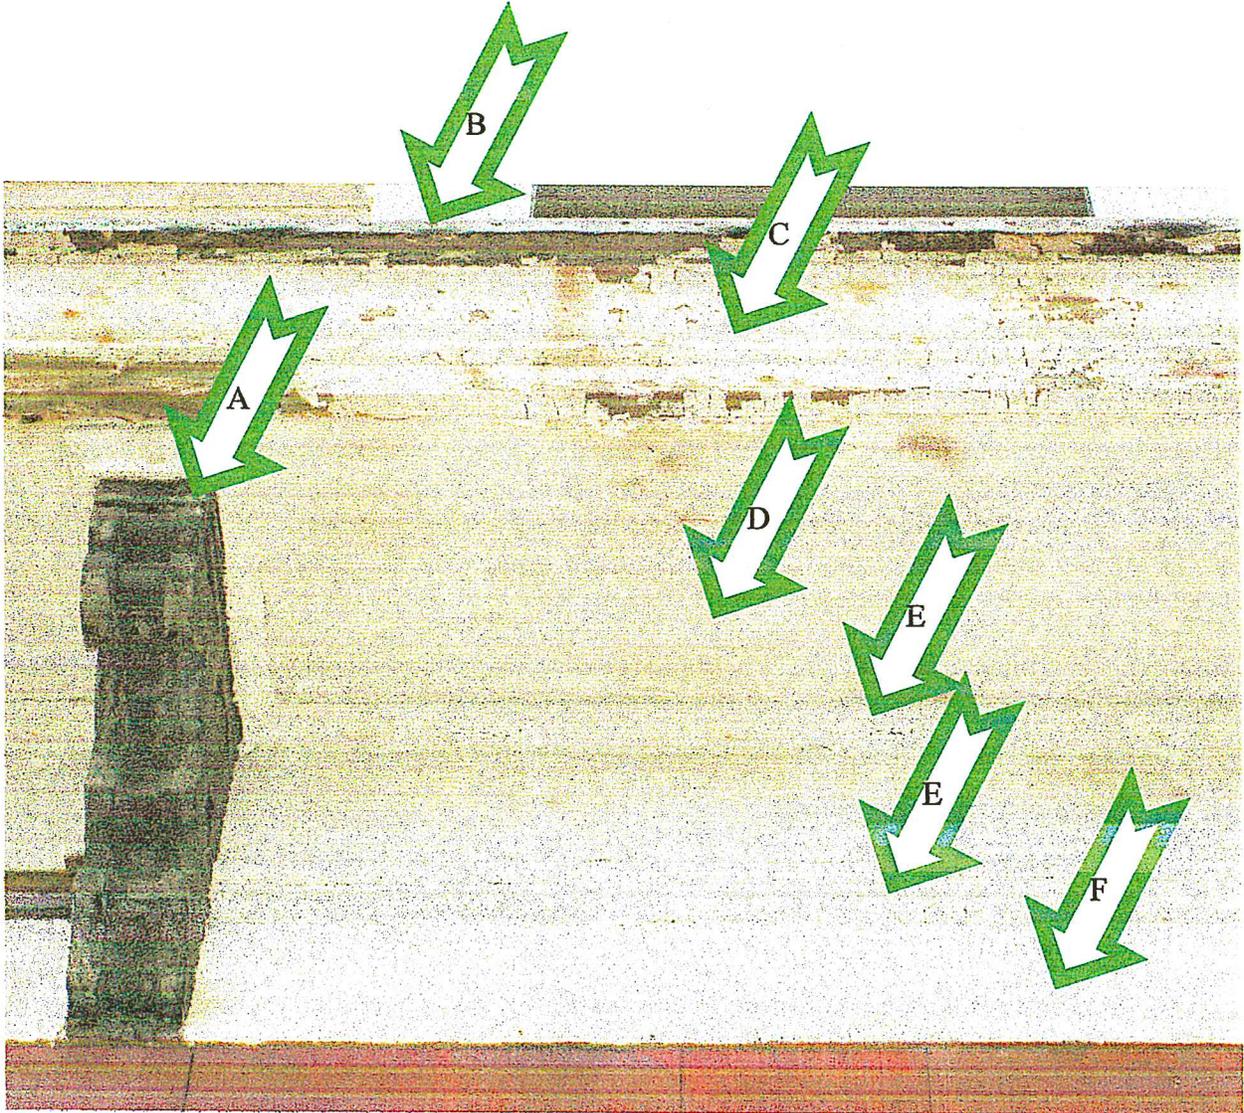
Exhibit A is a photograph of the existing ledge detailing the reconstruction to be completed, including labels corresponding with the following descriptions:
